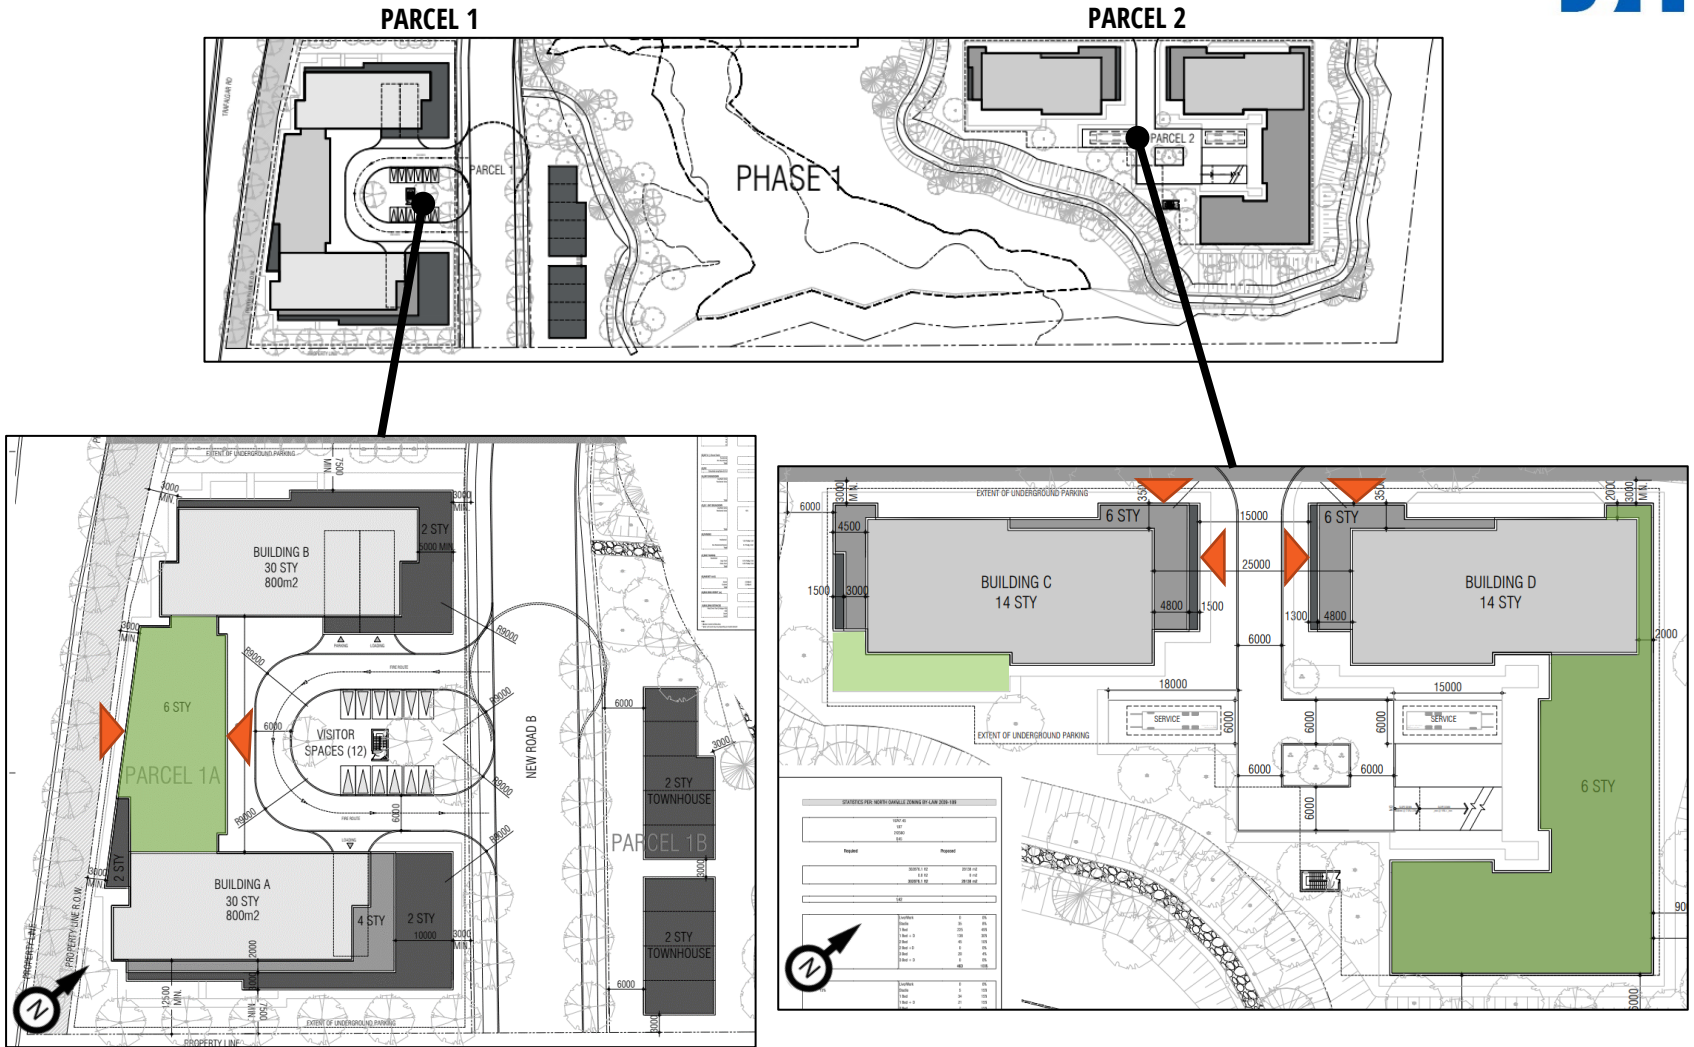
Overall Site Plan and Floor Plans Identifying Key Outdoor Areas of Interest
